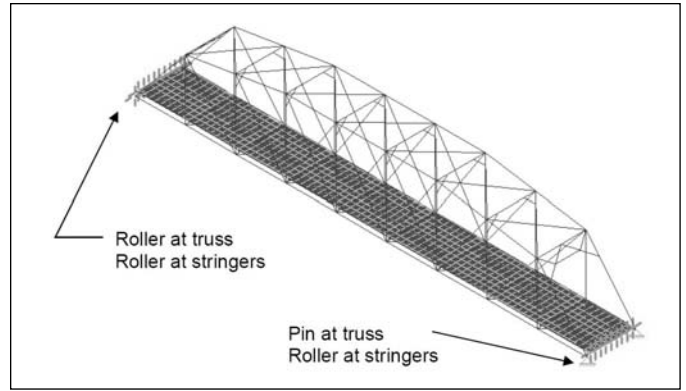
A typical 3-D deck model. The deck is modeled as plate elements, added to the skeleton model. The stringers were added to the skeleton model as frame elements, and the deck was added using plate elements. This model is of Prowers Bridge, which has the plate elements interconnected at all their nodes, or corners.
